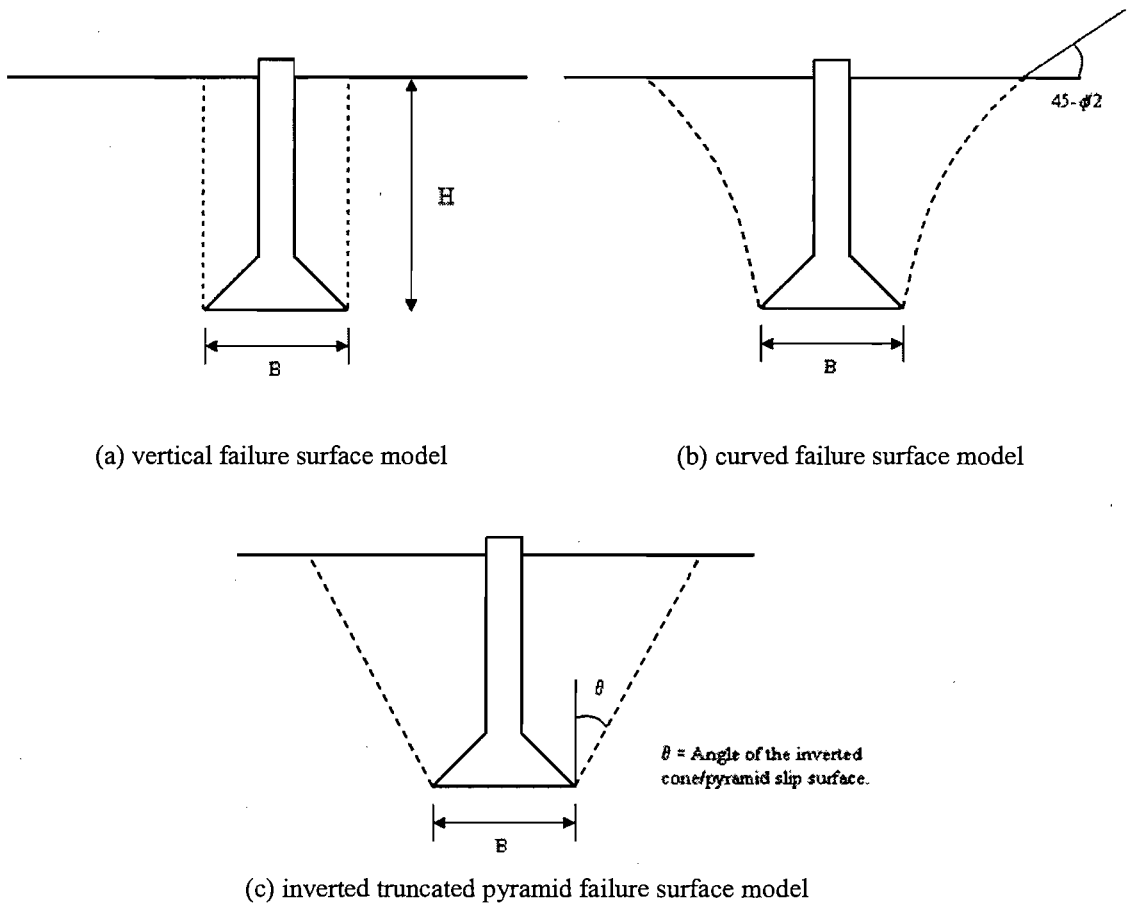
Assumed failure surface models for shallow foundations in uplift
